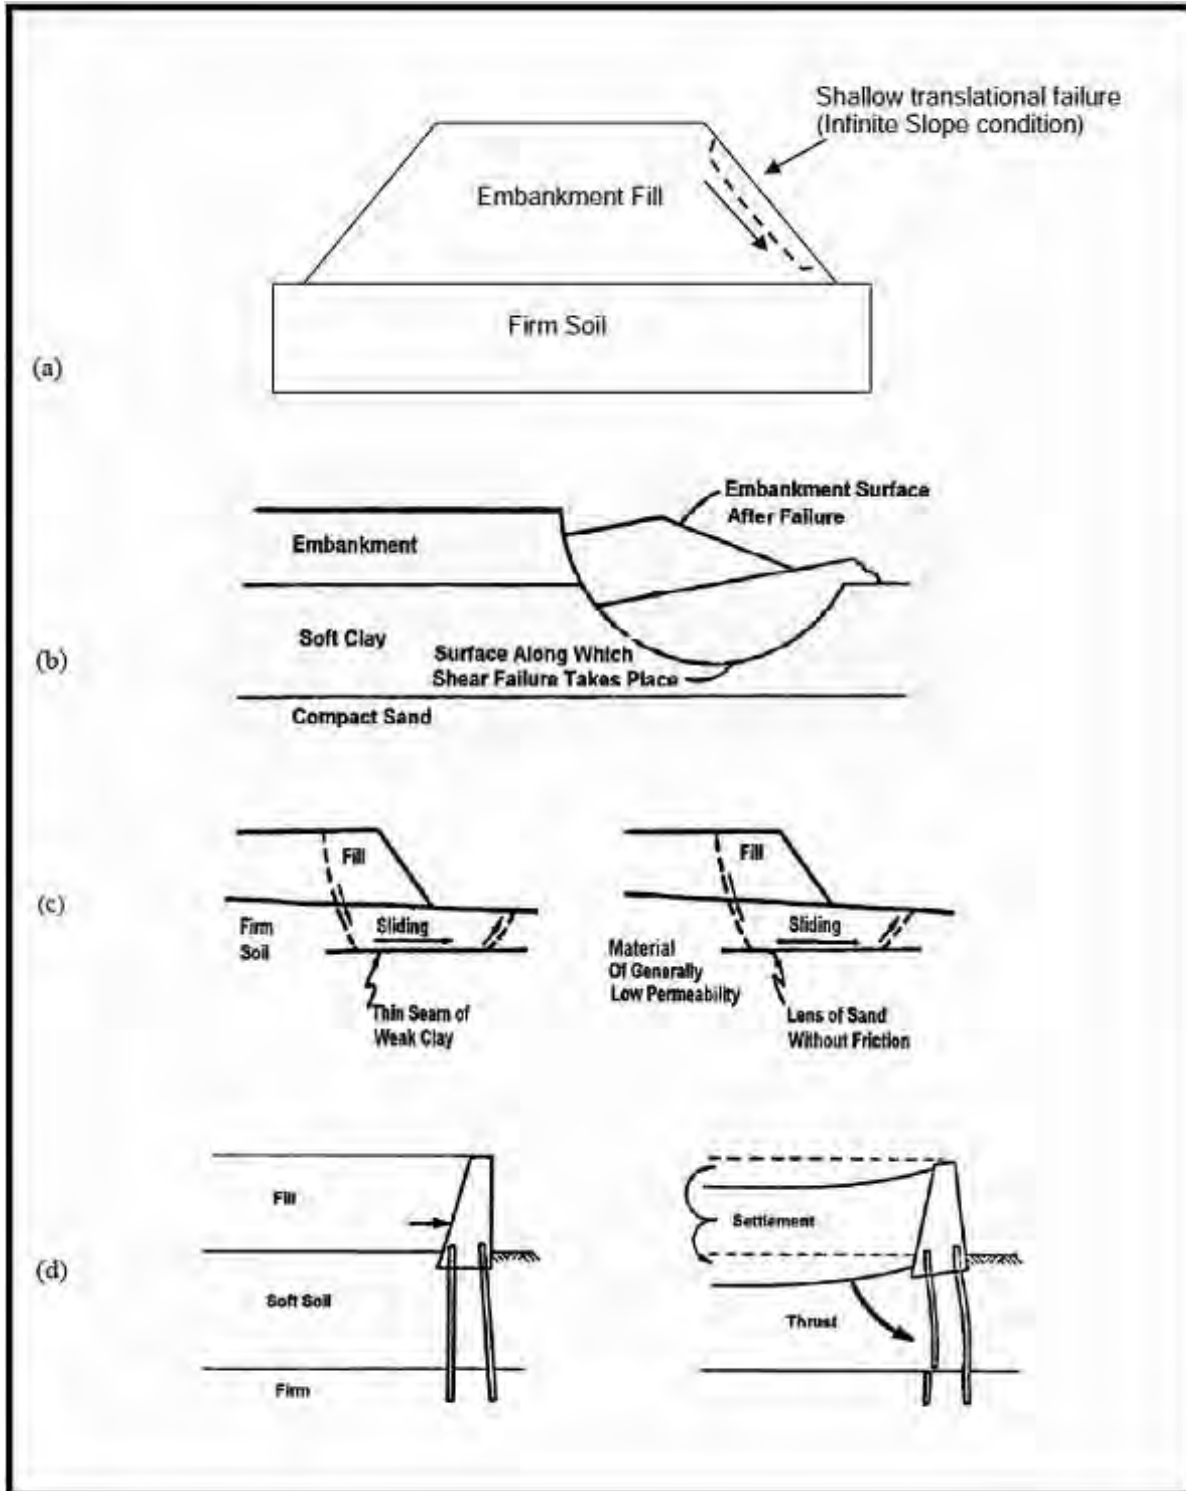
Embankment failures: (a) Infinite slope failure in embankment fill, (b) Circular arc failure in embankment fill and foundation soil, (c) Sliding block failure in embankment fill and foundation soil, and (d) Lateral squeeze of foundation soil.
